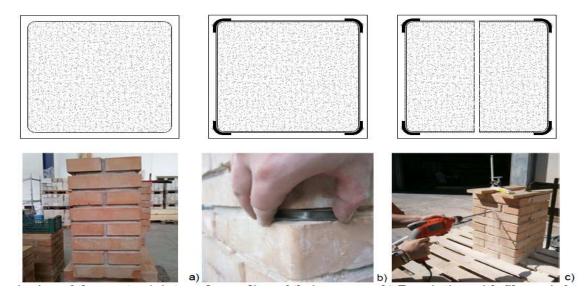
3: a) Stripping of the mortar joints and rounding of their corners; b) Repointing with fiber reinforced mortar and application of steel angles; c) Hole drilled through the member cross section.
